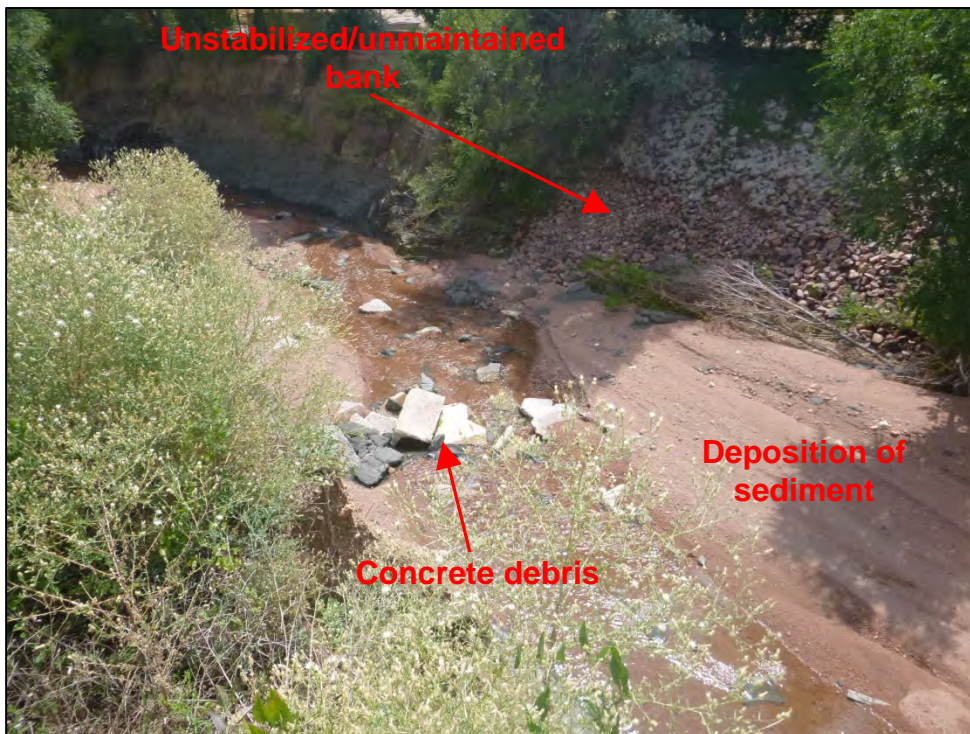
Additional view of erosion and scouring, concrete debris, and deposition of sediment in the N. Douglas Creek channel downstream of the I-25 box culvert outlet.
